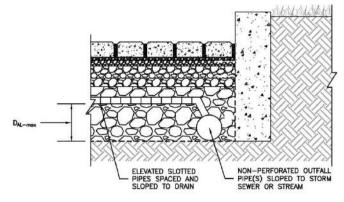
PICP Facility with Elevated Drain Source: Adapted from Smith (33)
